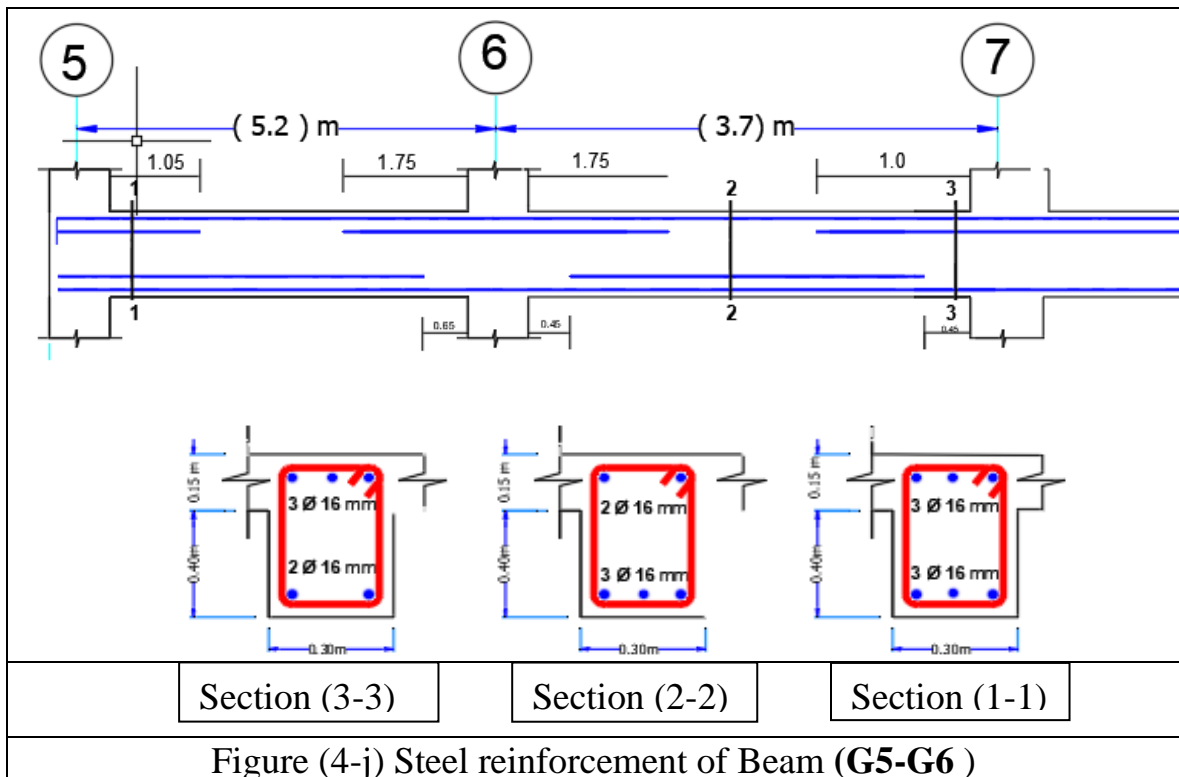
j) Steel reinforcement of Beam (G5-G6)
